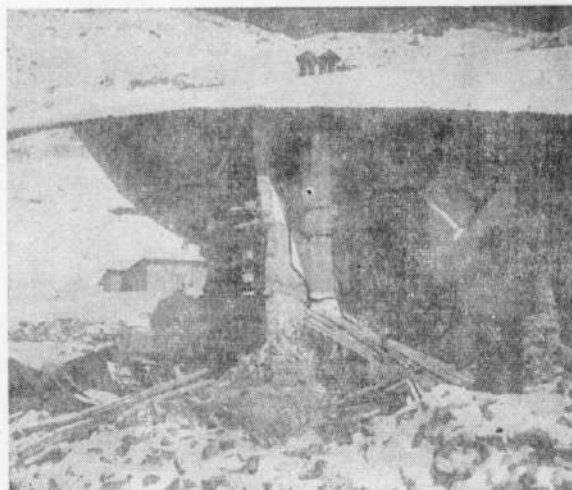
Collapse of outer and inner walls and failure of roof trusses in the office-cum-residence of Agricultural Authority at Leo village. Single storeyed stone masonry house in cement mortar seen in the background developed only cracks along mortar joints and plaster fell down in the interior.
